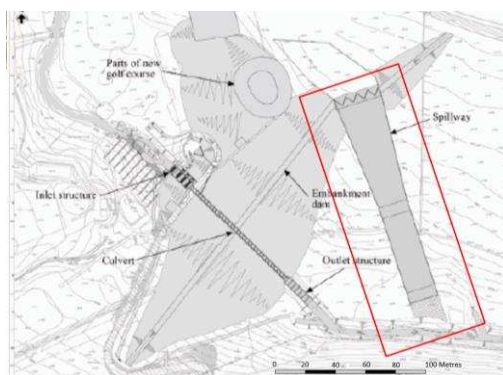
Layout of the hydraulic structures from Brinded et al. (2014)
